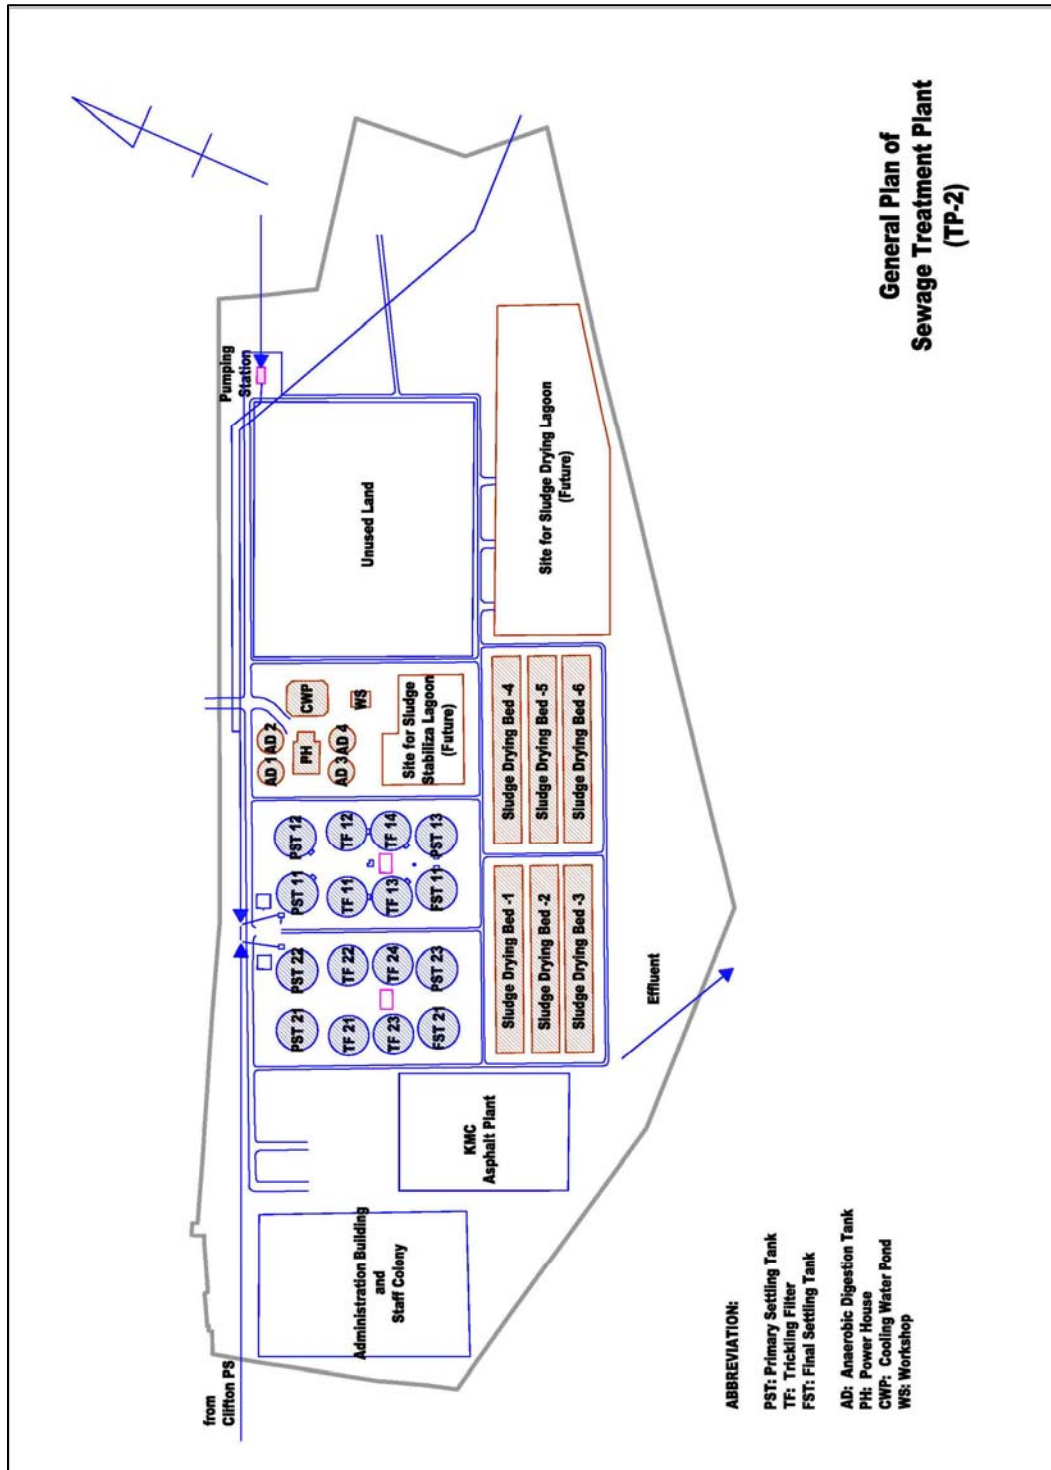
General Plan of Sewage Treatment Plant TP-2
